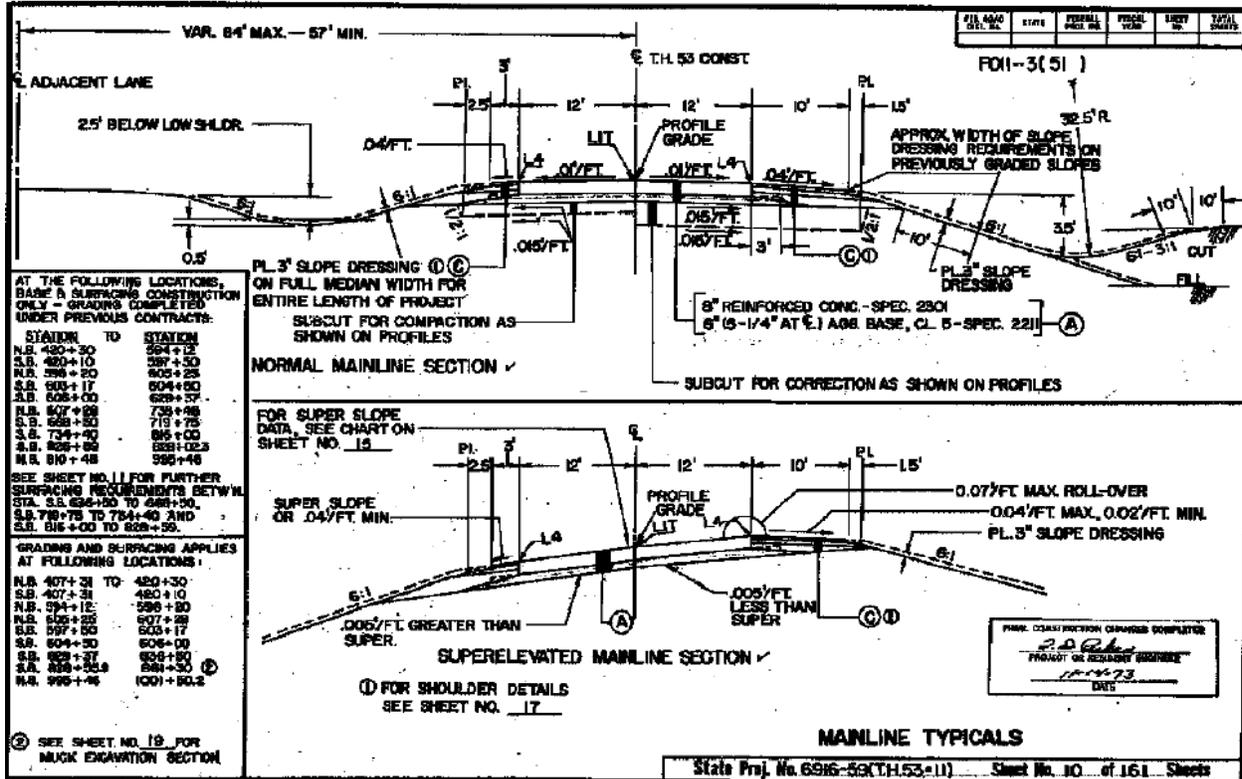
Mainline Typical Sections for 1972 TH 53 Project
